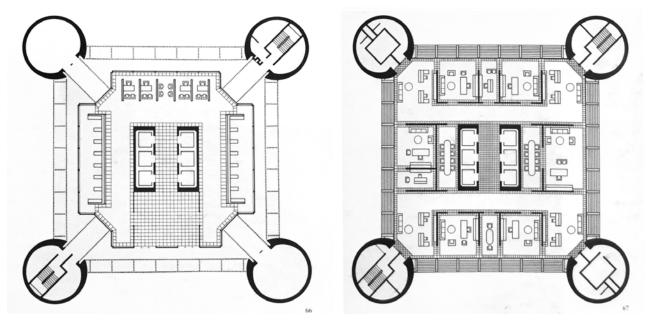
Plan views of the Mezzanine and selected upper level. Drawings provided by the architect for publication (Dal Co 1985, 117).
